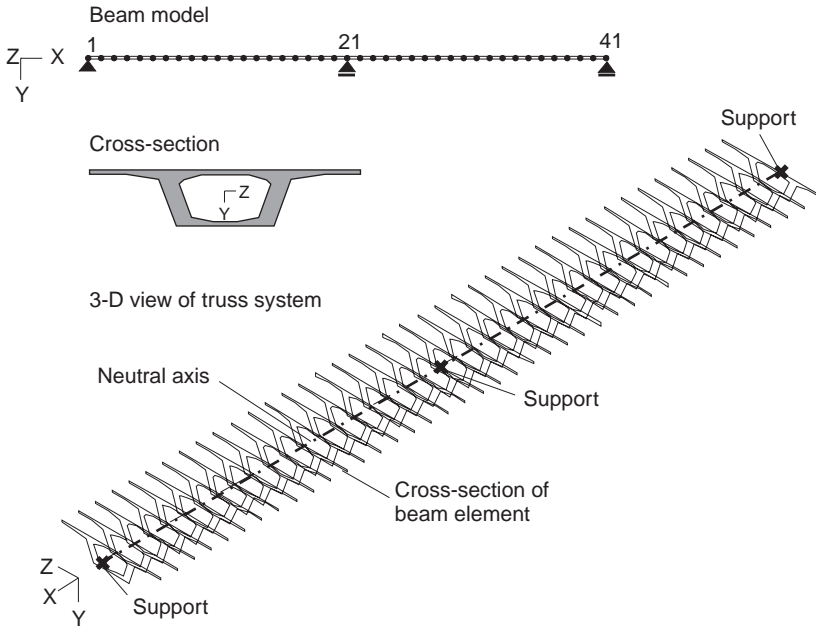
Numerical model of a two-span hollow box girder bridge
